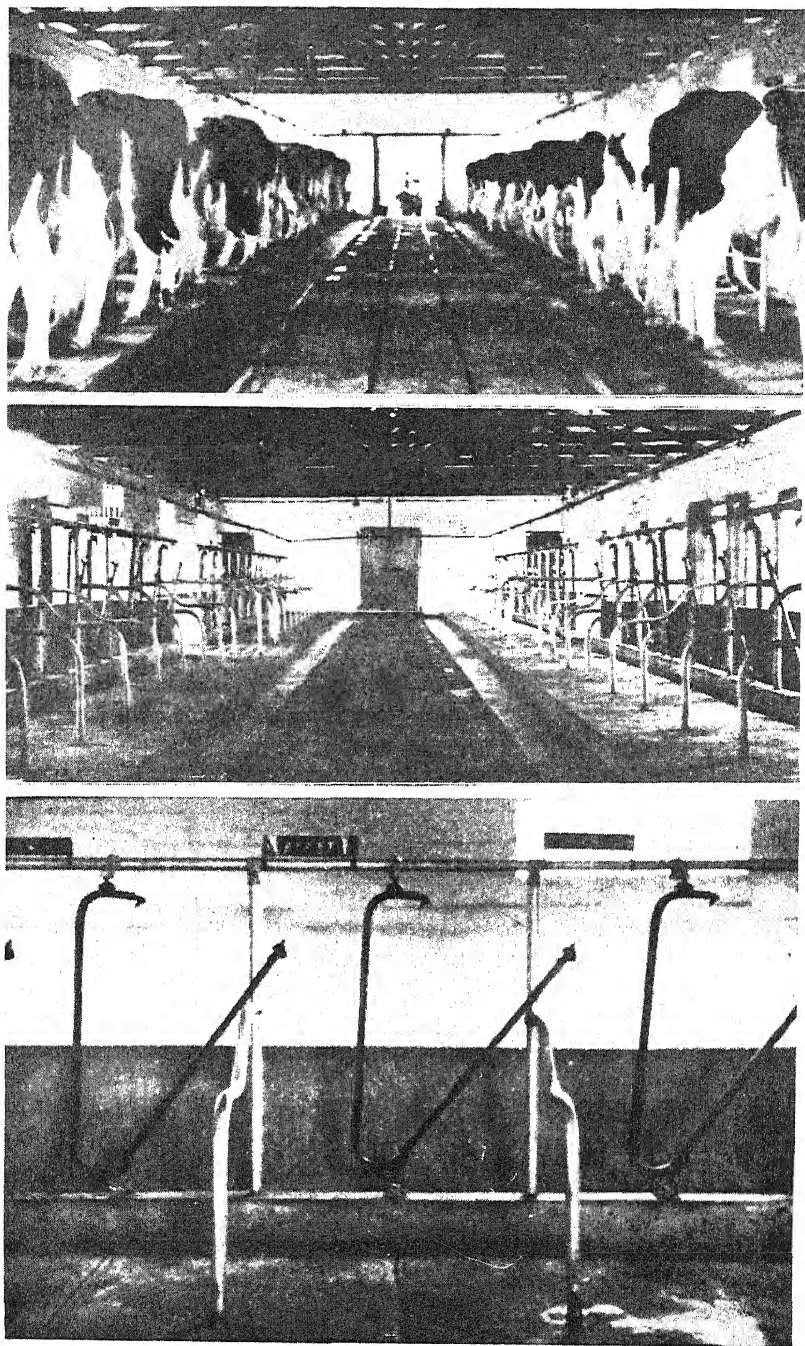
A well designed, properly constructed cowshed equipped with modern fittings.
